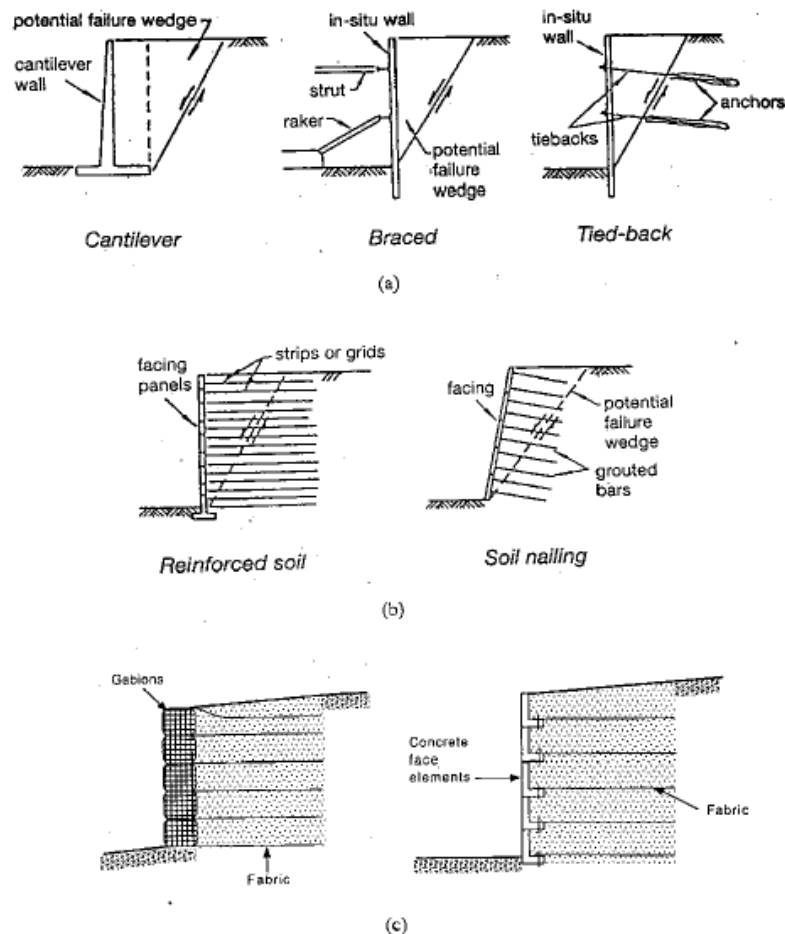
Retaining Wall System Examples (Jones, 1997).
